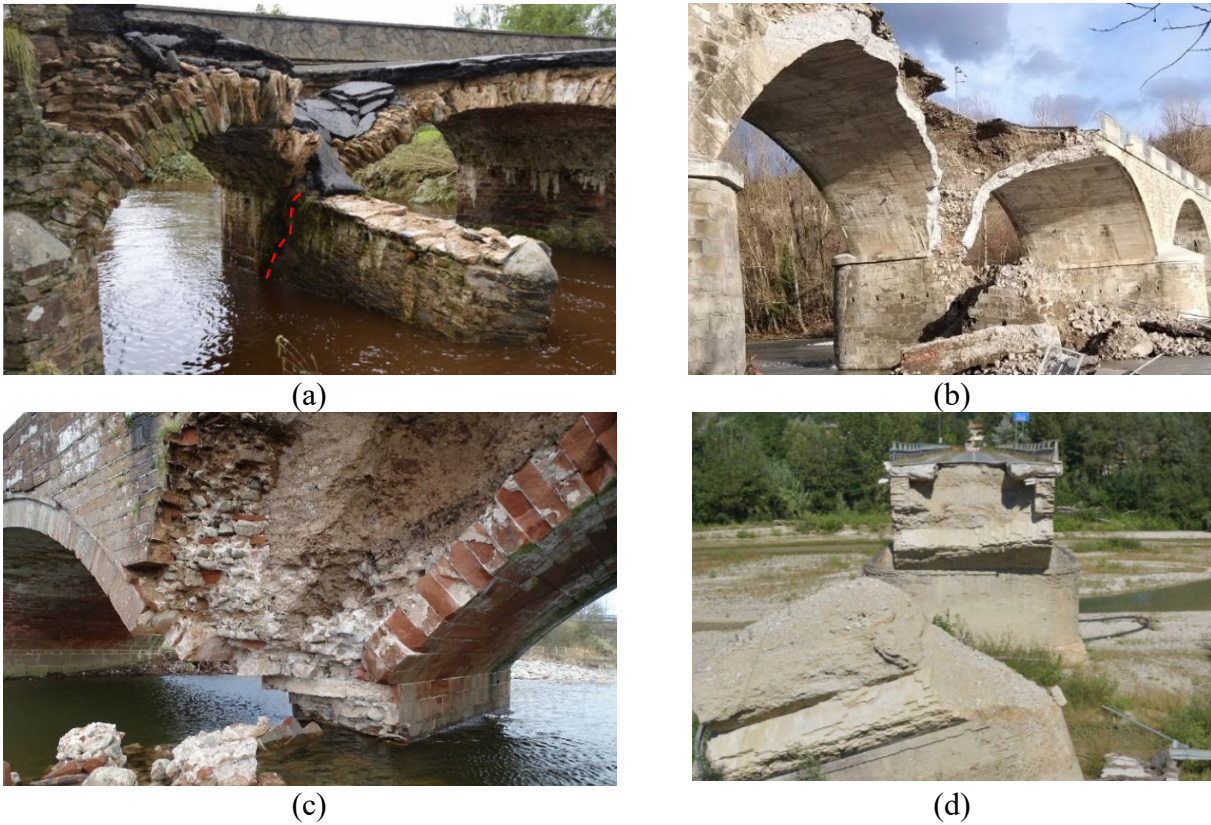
Examples of masonry arch bridge failure mechanisms. View from the upstream of: (a) Ballynameen Bridge over the River Faughn, Northern Ireland (photo courtesy of Gareth Scullion); (b) Samone Bridge on Panaro River, Italy (photo courtesy of lapressa.it); (c) Brougham Old bridge. (d) Lateral view of the collapsed Rubbianello bridge on Aso River, Italy.
